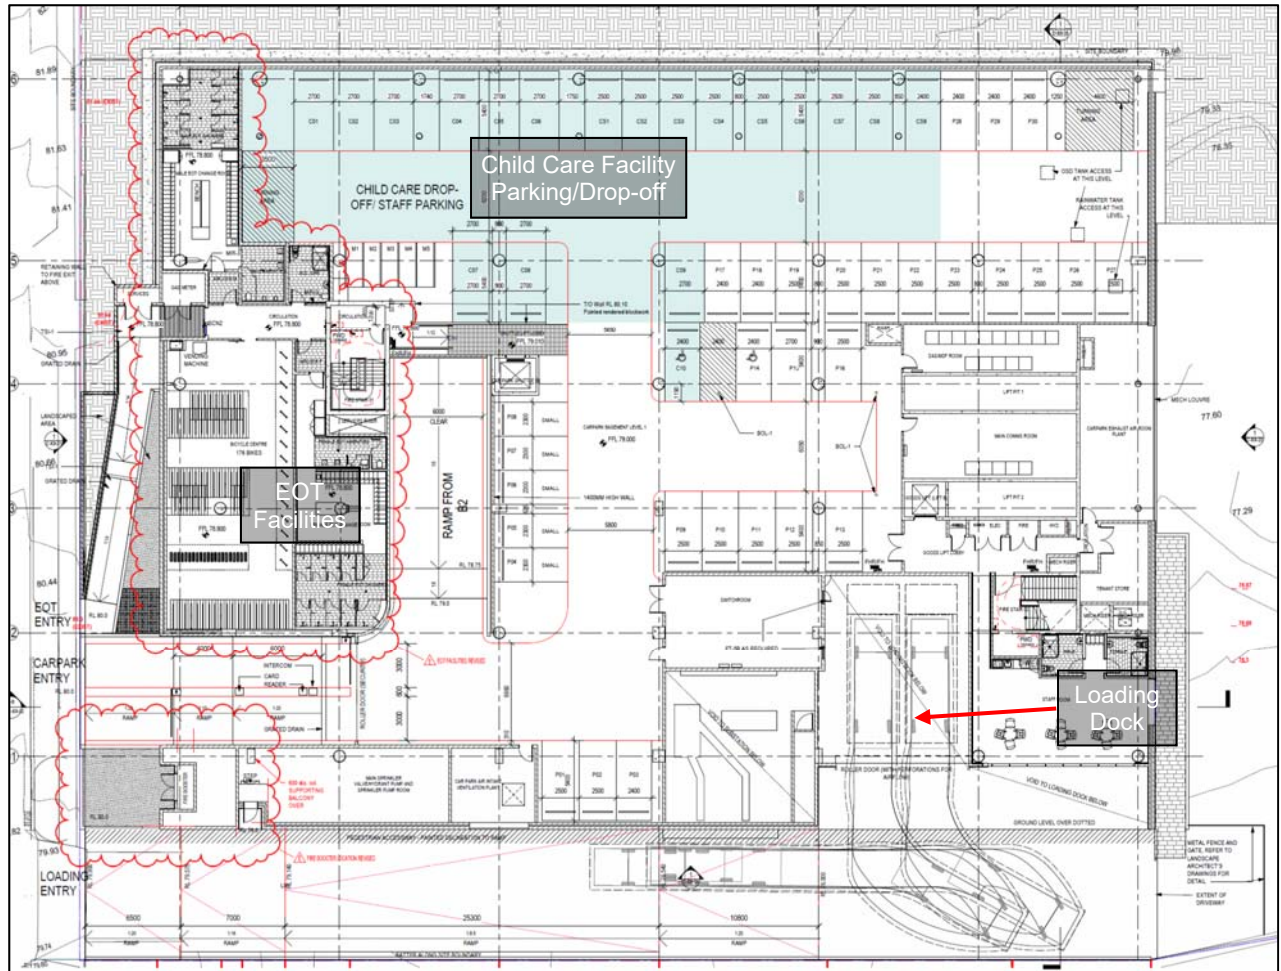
Basement Level One Plan (source: RtS – BVN Architects)
